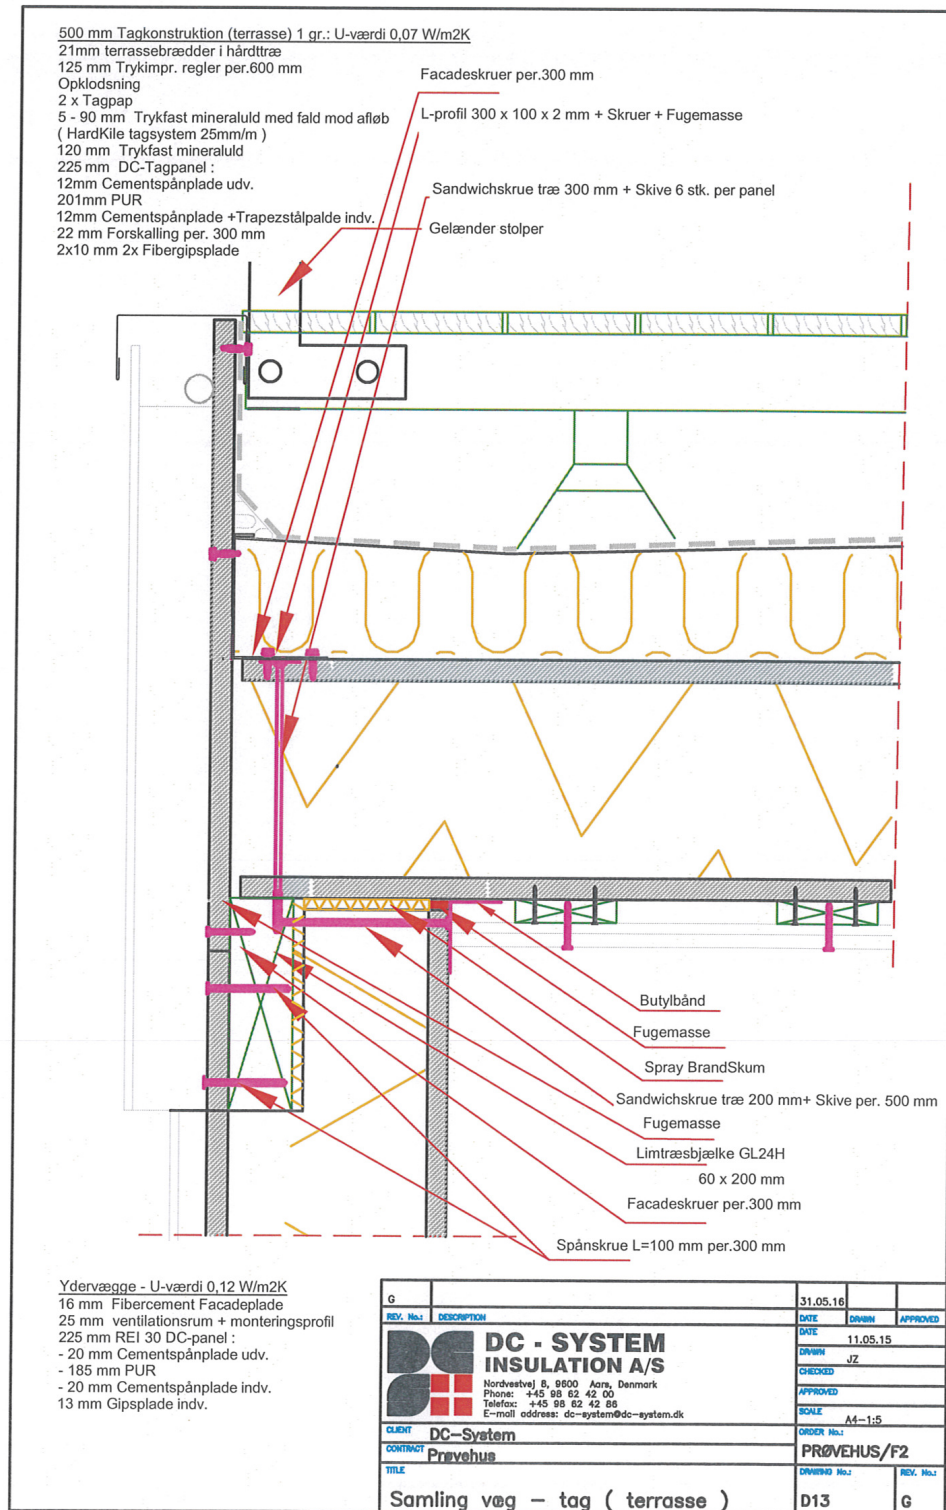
Detail: Wall-roof (Room 1).[DC-System, Test House (2015)]
